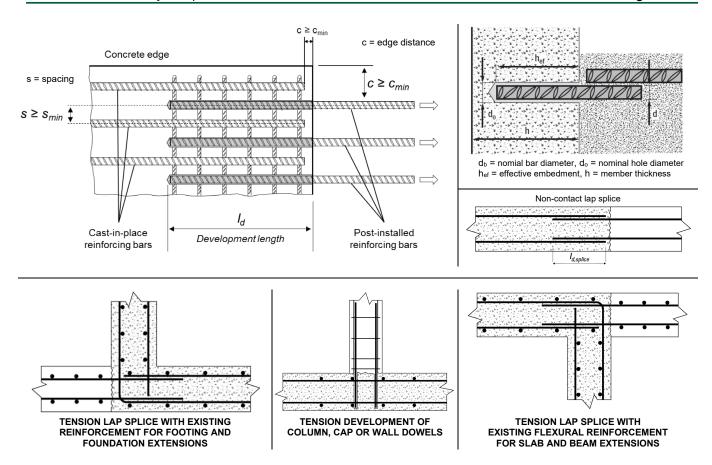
INSTALLATION DETAIL FOR POST-INSTALLED REINFORCING BAR CONNECTIONS (Top Pictures), EXAMPLES OF DEVELOPMENT LENGTH APPLICATION DETAILS FOR POST-INSTALLED REINFORCING BAR CONNECTIONS PROVIDED FOR ILLUSTRATION (Bottom Pictures)
